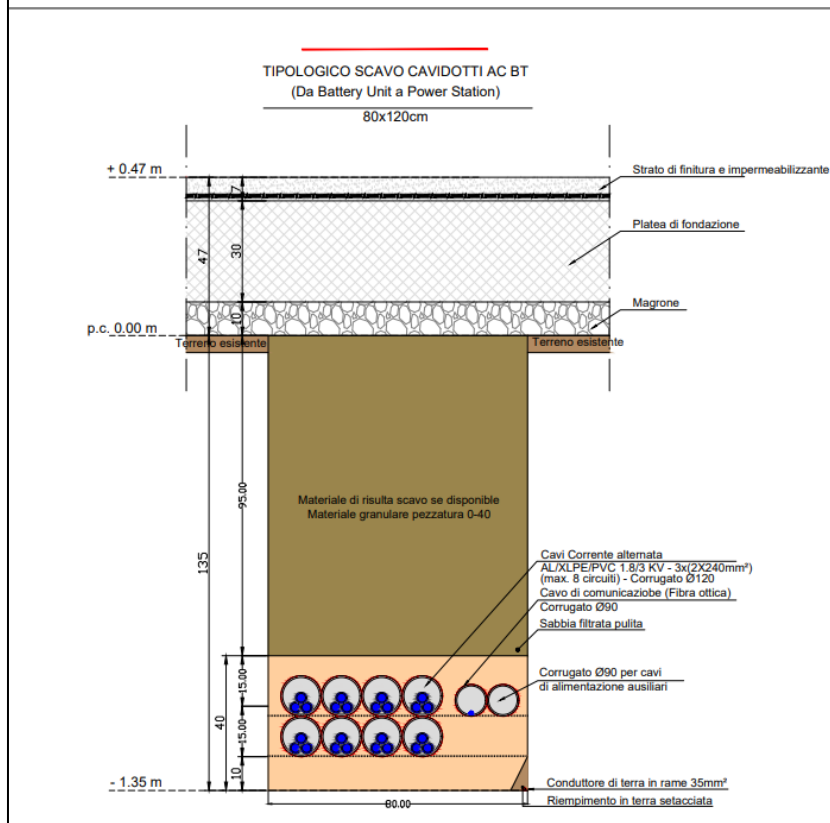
Extract of table "Layout plant: excavations planimetry"
